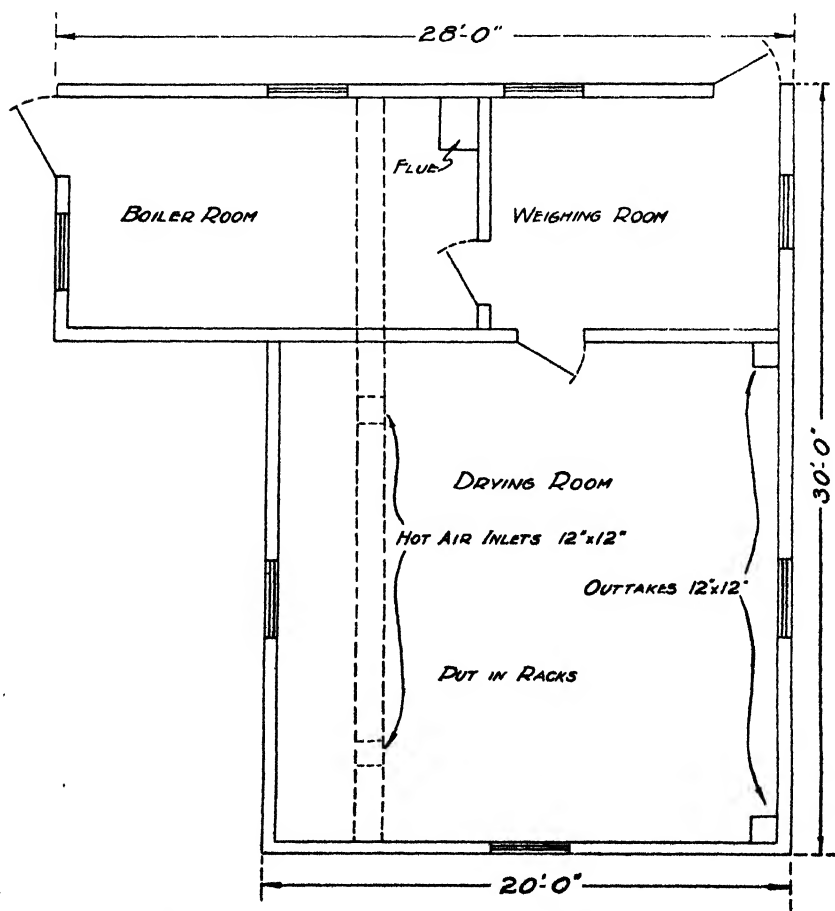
Sketch of floor plan for drying house in use by the Agronomy Department of the West Virginia Experiment Station. (Drawings and sketch by F. D. Cornell, Department of Farm Economics.)
